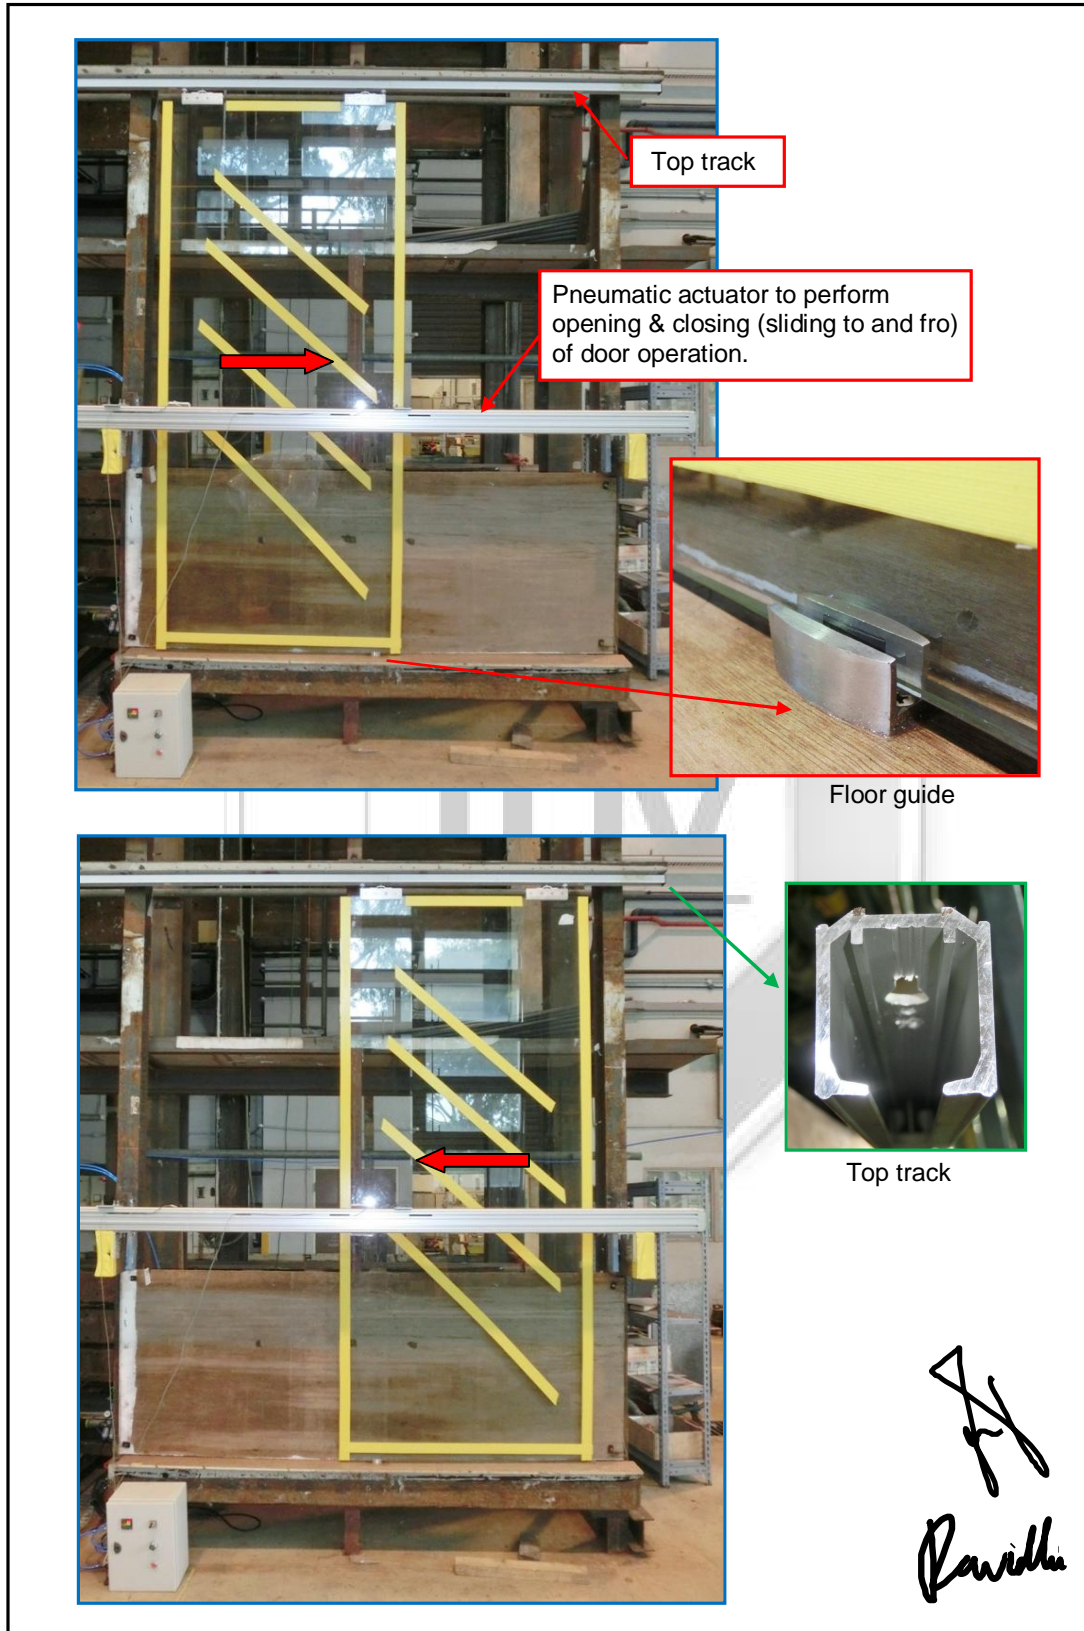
CKS-SL890 sliding glass door system undergoing endurance test
